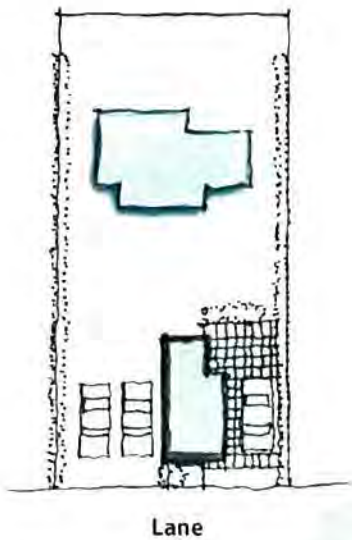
Dedicated coach house parking separate from parking for principal dwelling
